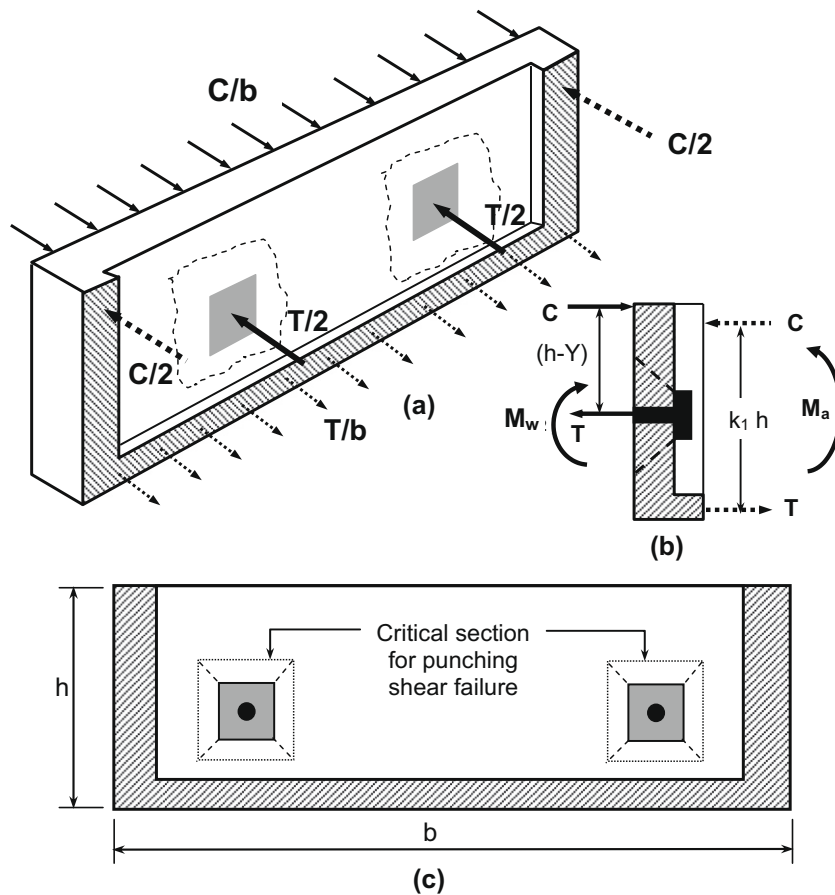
Modeling of closing joint failure: (a) Three-dimensional view of joint showing the forces developed, (b) Transverse view of the joint, and (c) Critical section for punching shear failure.
